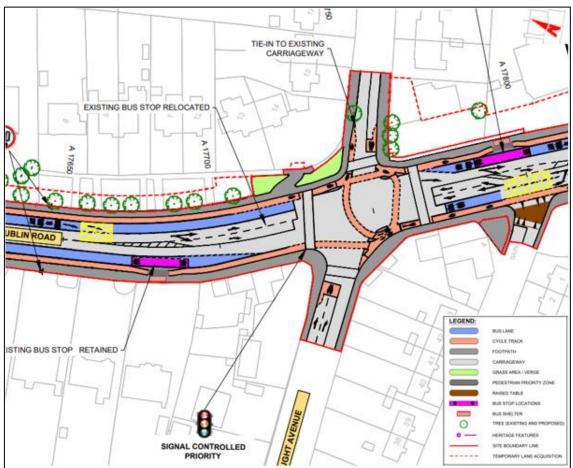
Extract from General Arrangement Drawings at Dublin Road / Corke Abbey Avenue junction (Sheet 50)
